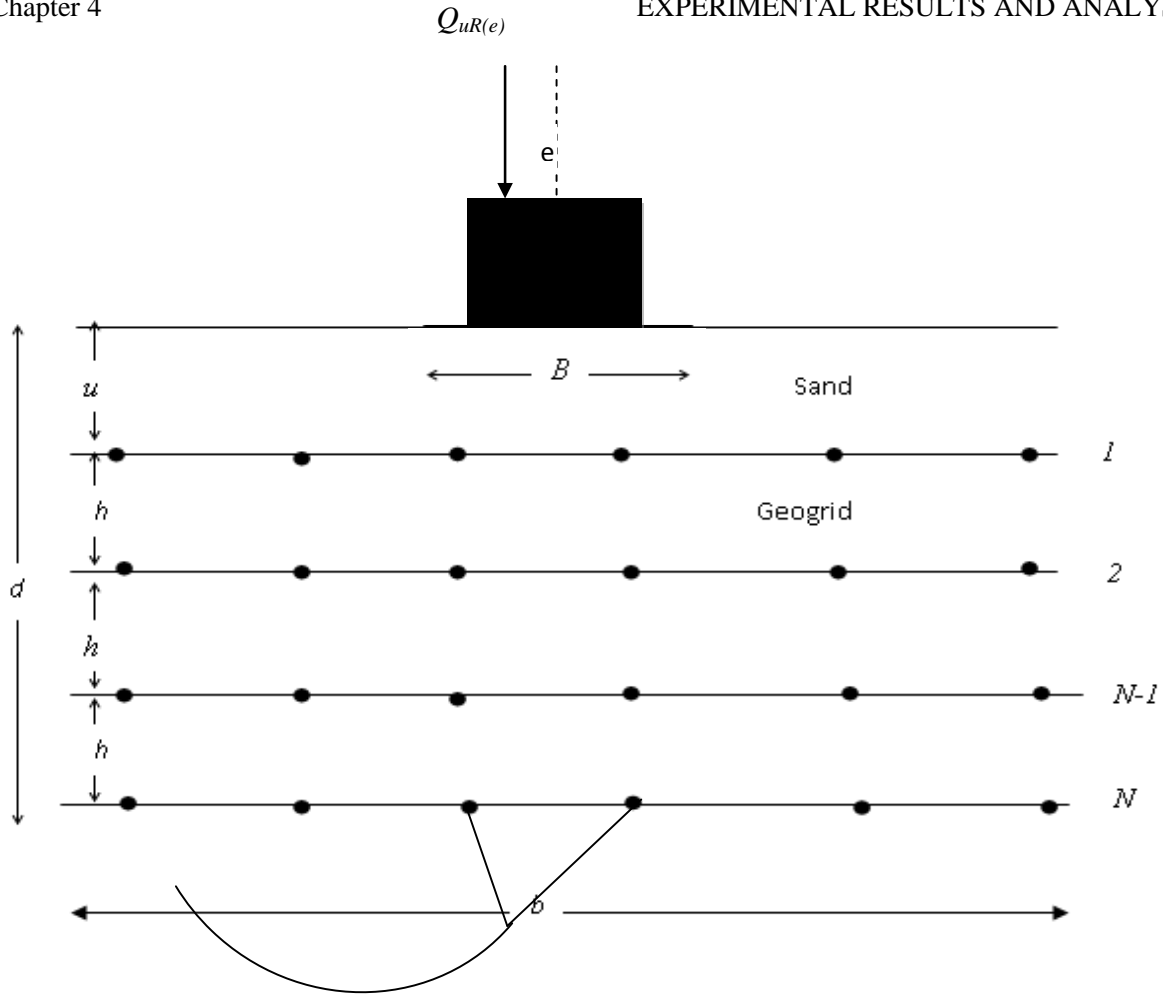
Assumed failure mode under an eccentrically loaded square foundation on geogrid-reinforced sand
